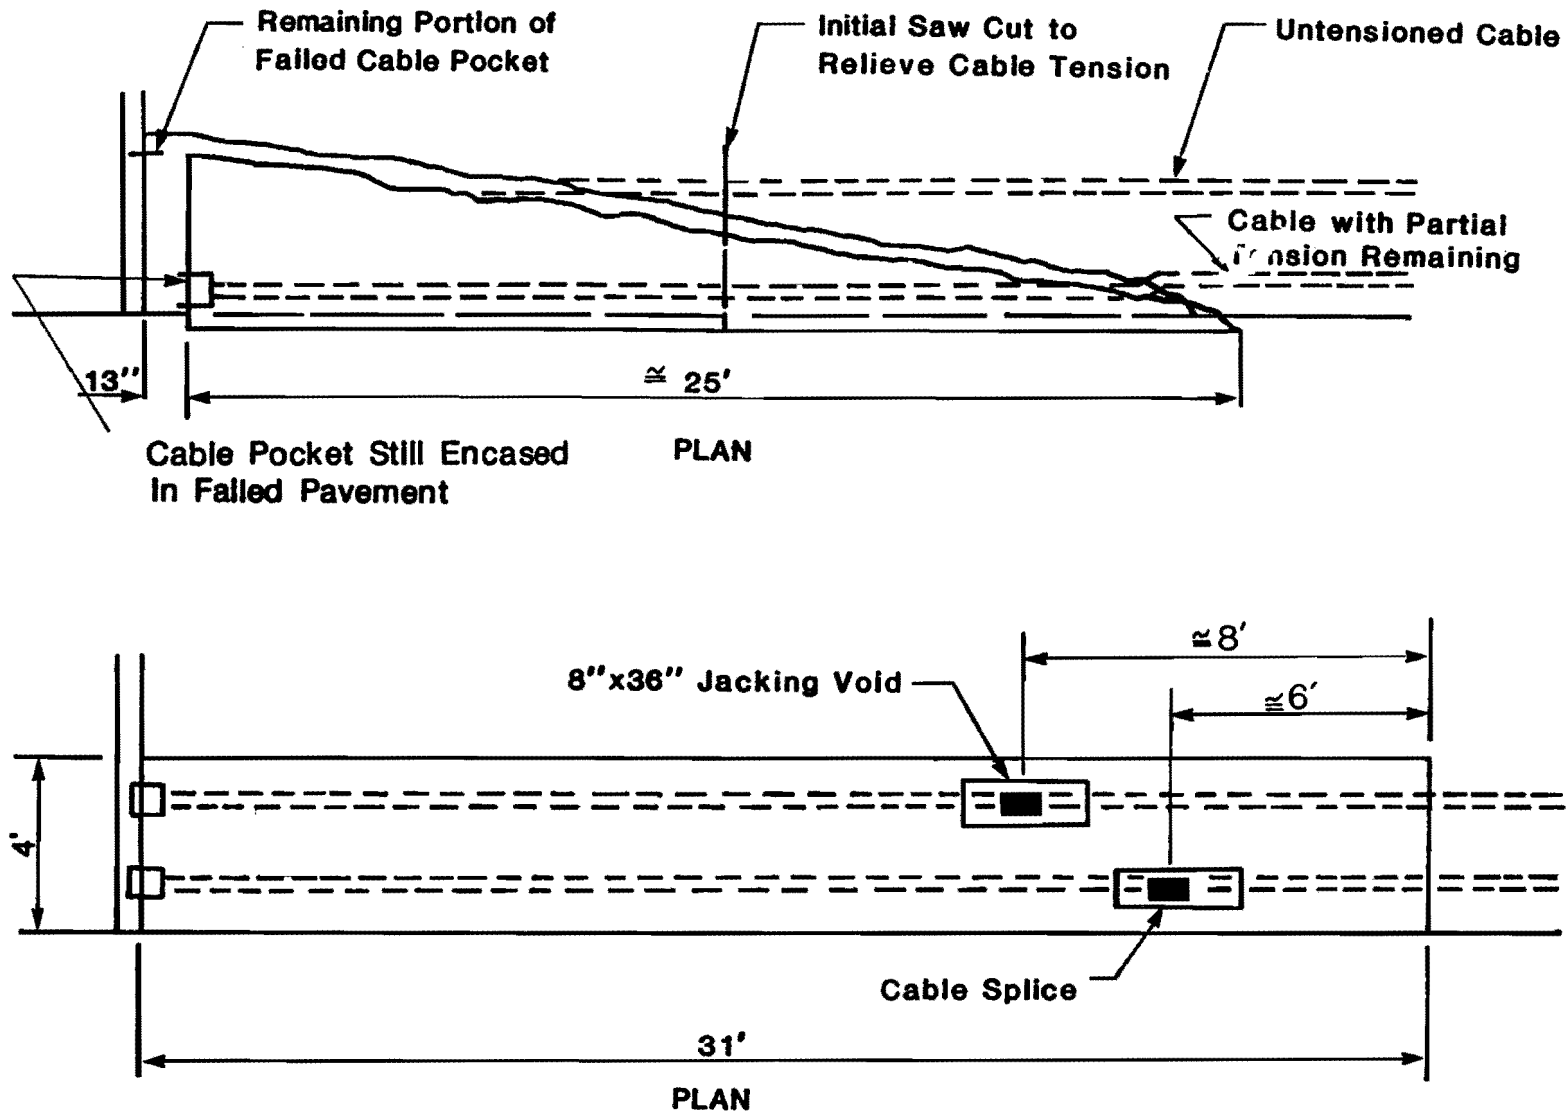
Prestressed pavement repair using stressing pockets (Ref 12).
